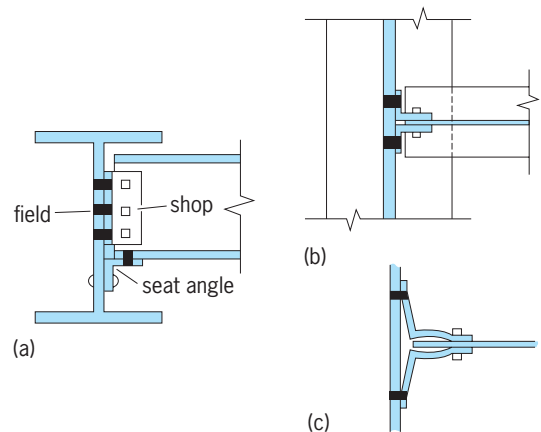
Riveted or bolted web connections. (a) Beam-to-girder, elevation view. (b) Plan view. (c) Bending of angle legs.
